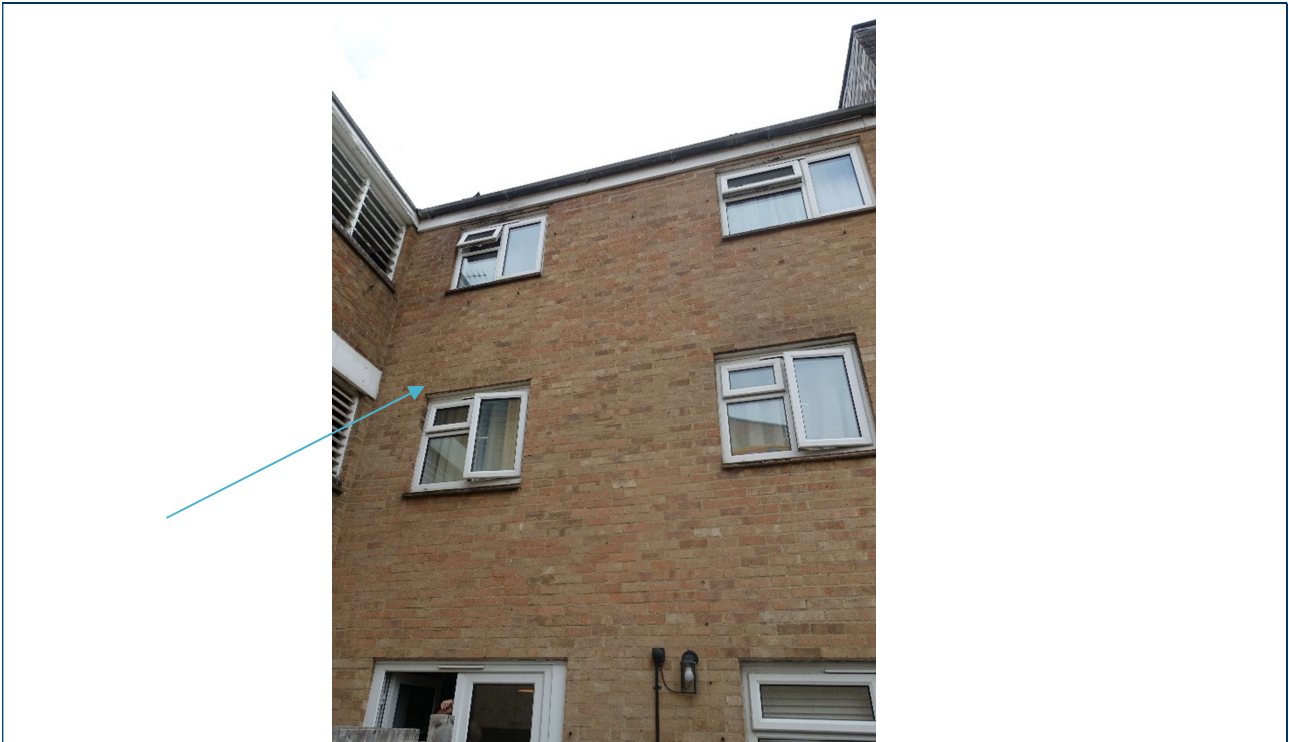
Rear Elevation (Arrow Indicating Intrusive Inspection Location)
